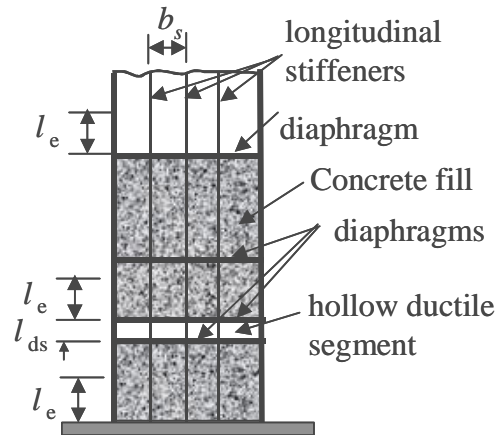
Outline of concrete-filled steel bridge pier column with energy absorption segment.
